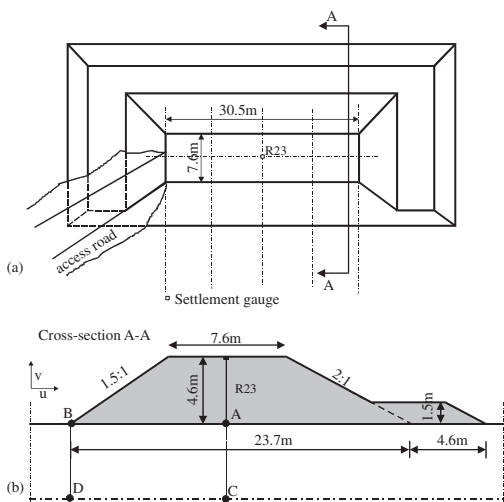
Test embankment A (a) plan view (b) cross section A-A.
